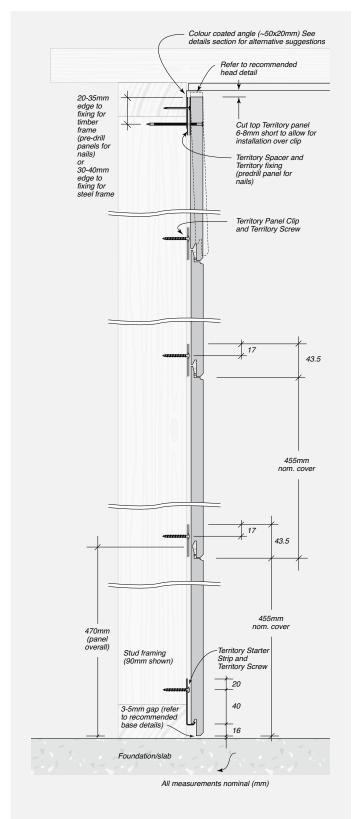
Typical System Cross Sectional Detail where Face Fixing is required – Timber Frame – Elevation
